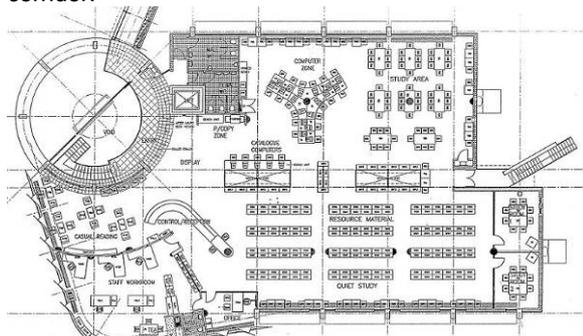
First Floor layout of building showing arrangement of open plan resource and computer area, study rooms and workroom.
